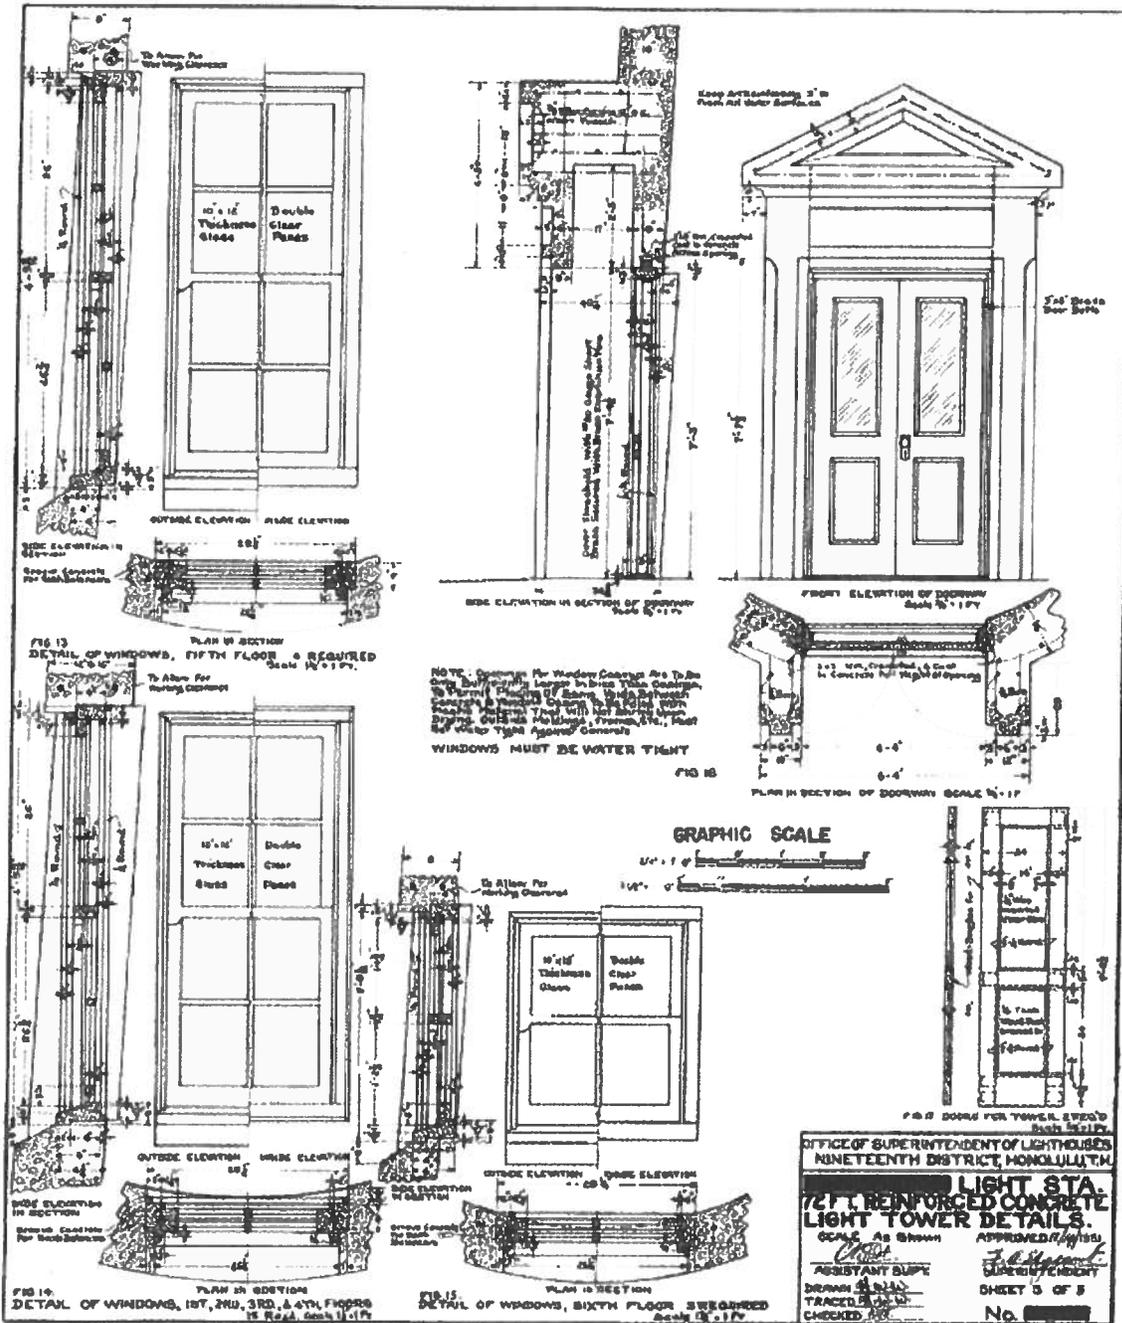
Design drawing for the Barbers Point Light built in 1933 replicated from design for the Nawiliwili Harbor Light built in 1932, with lighthouse lantern added (on file at U.S. Coast Guard Civil Engineering Unit Honolulu).
